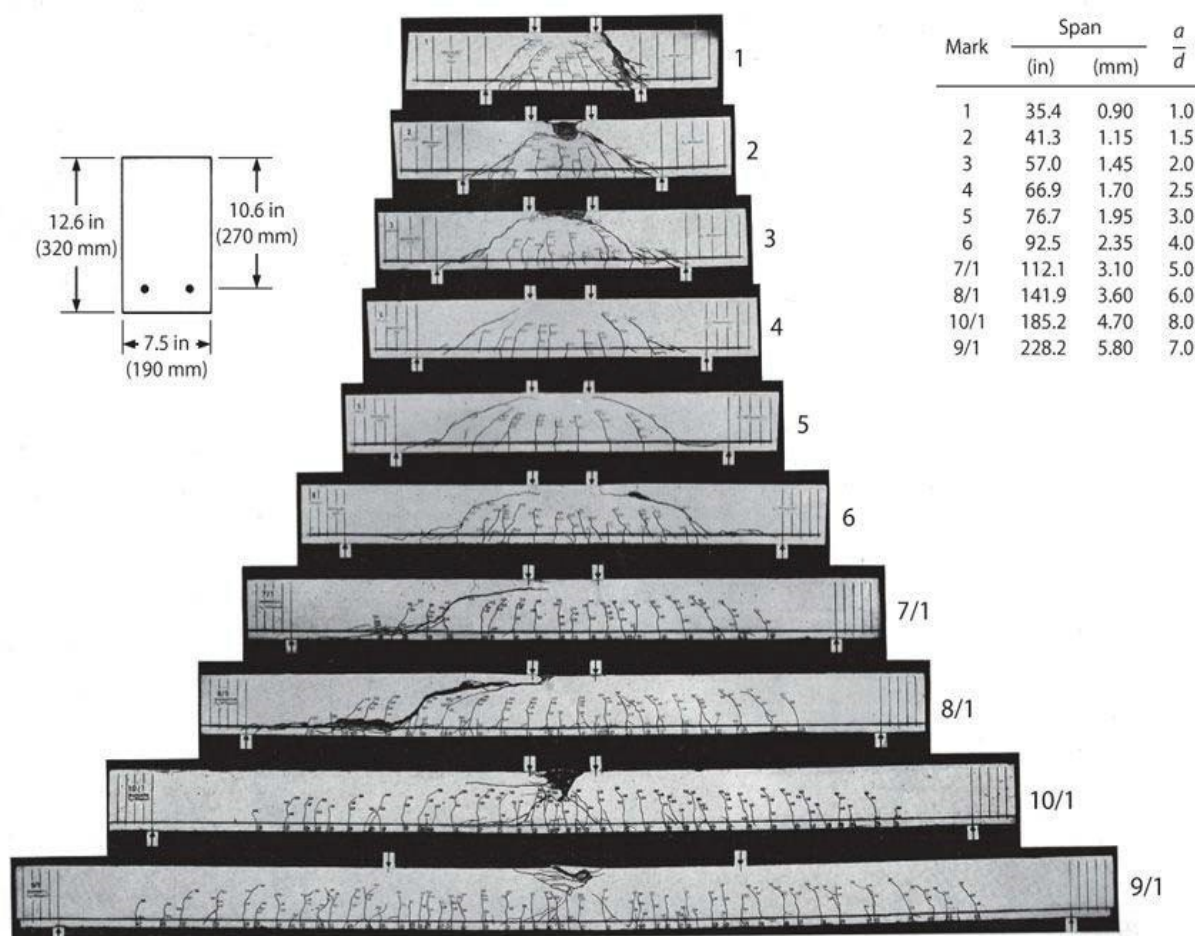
Damage at failure in series of tests on beams without transverse reinforcement. (After Leonhardt, 1962.)
